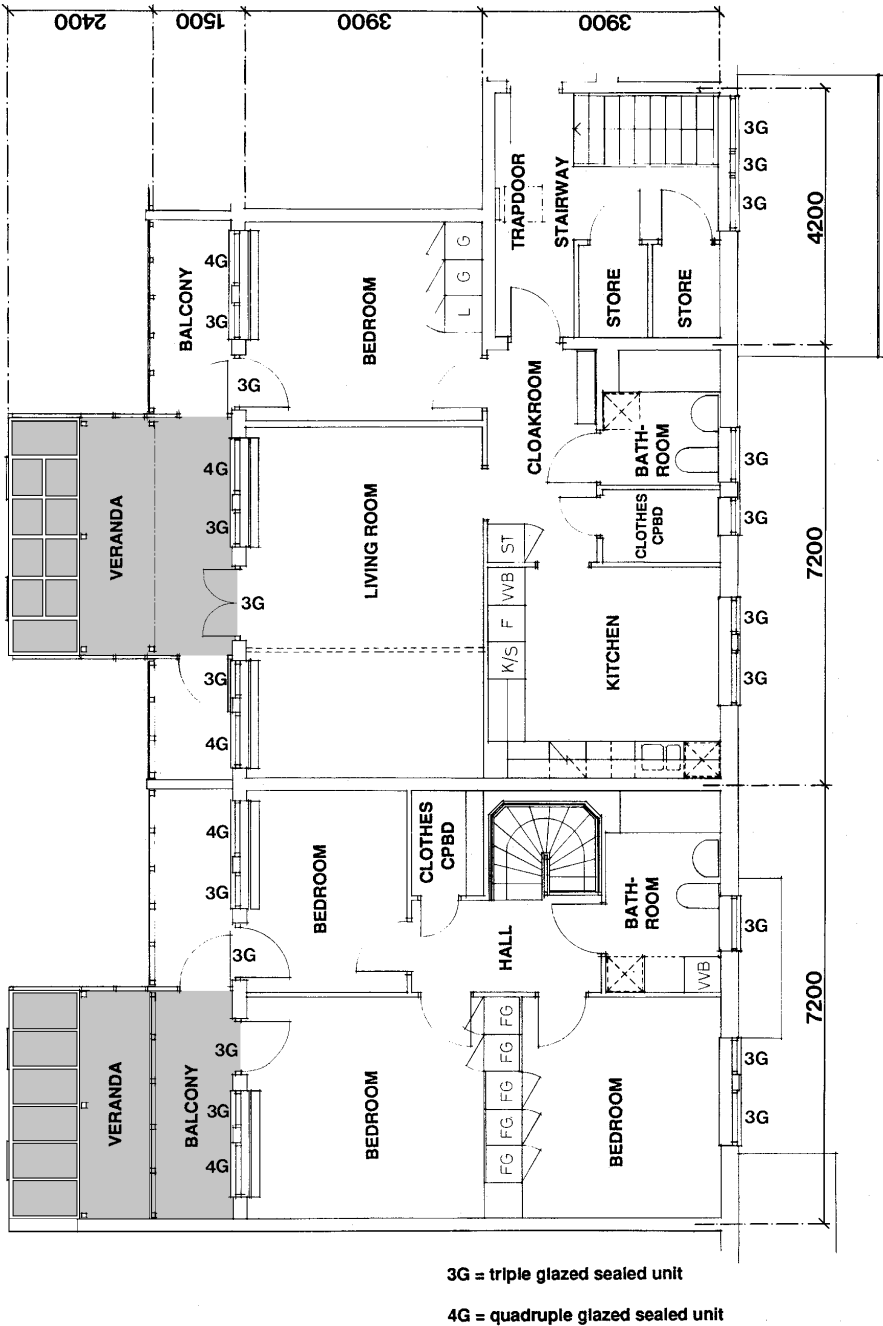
Part of 4 rooms+kitchen and 2 rooms+kitchen, first floor (Fredlund, 1989).
